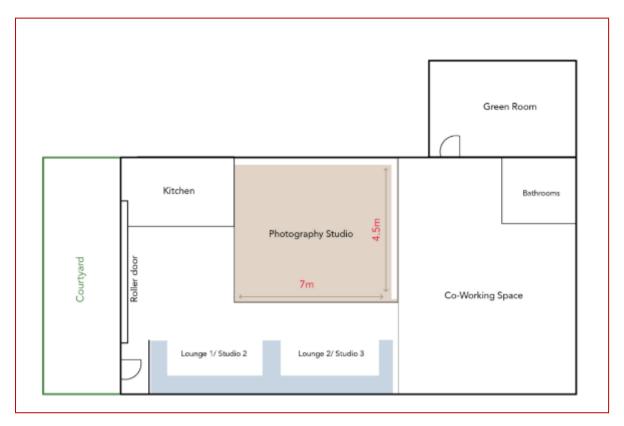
PROPOSED FLOOR PLAN (SOURCE: SHUFFLEMEDIA PRODUCTIONS FLOOR PLAN)
